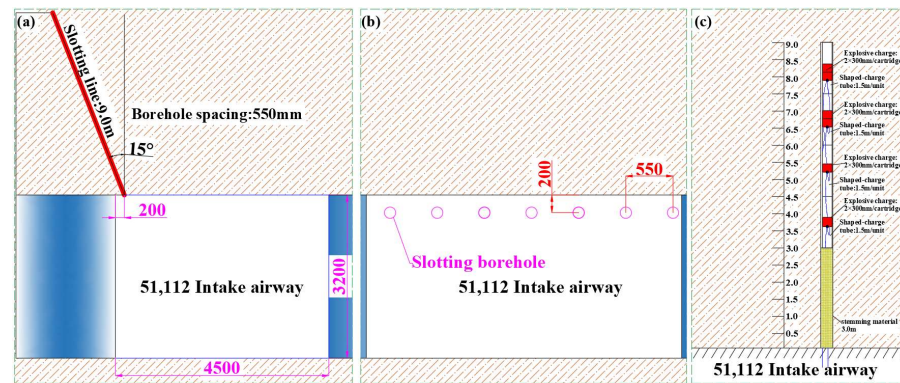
Slot drilling design diagram: (a) cross-section; (b) plan view; (c) slot charging parameters.
